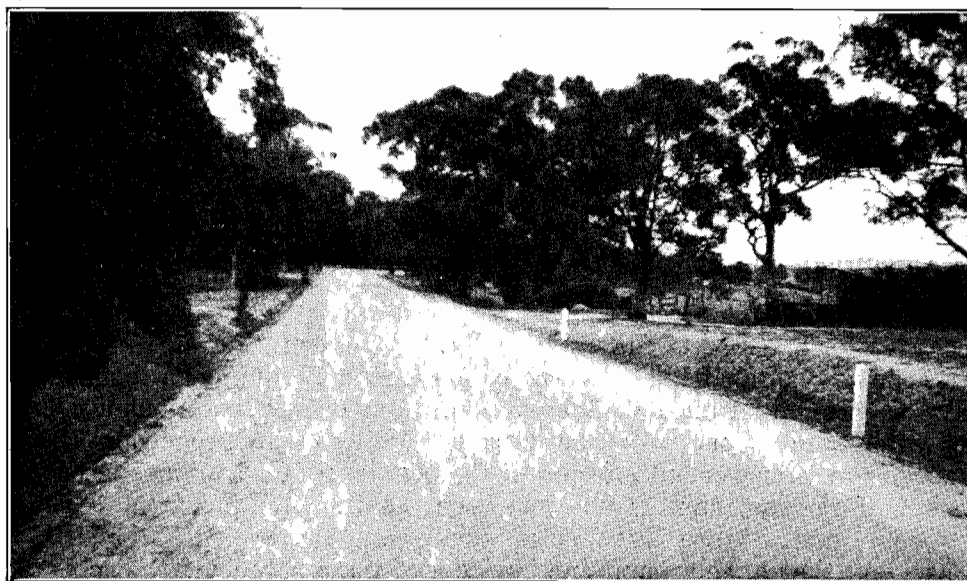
Showing section of the Midland Highway between Buninyong and Ballarat.
